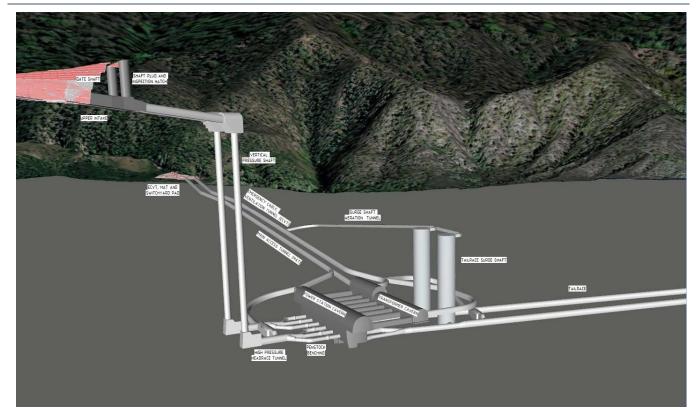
Tunnel configuration incorporating water tunnels, powerhouse cavern, cable tunnel and access tunnel
